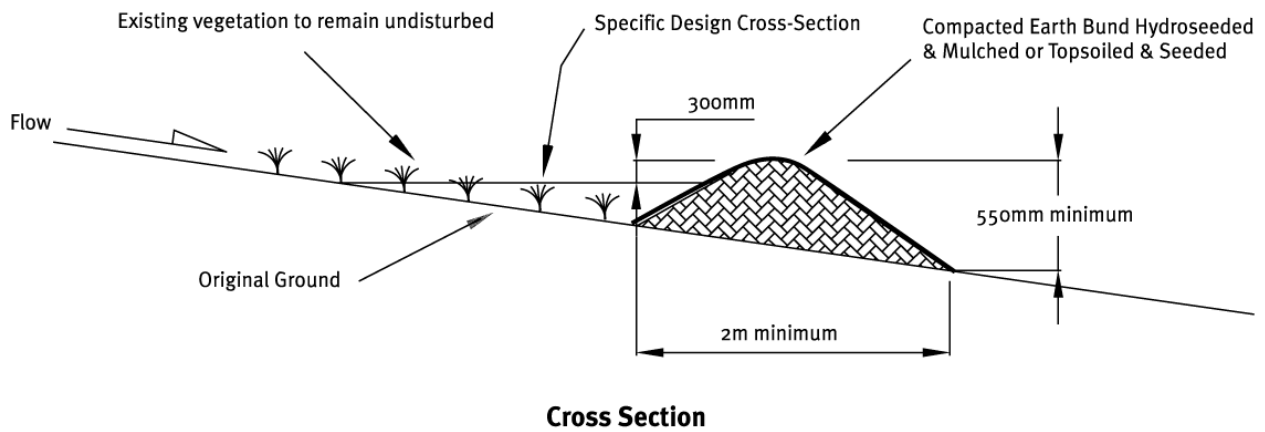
Typical Cross section of a clean water diversion bund (Note, river run gravel maybe used).
